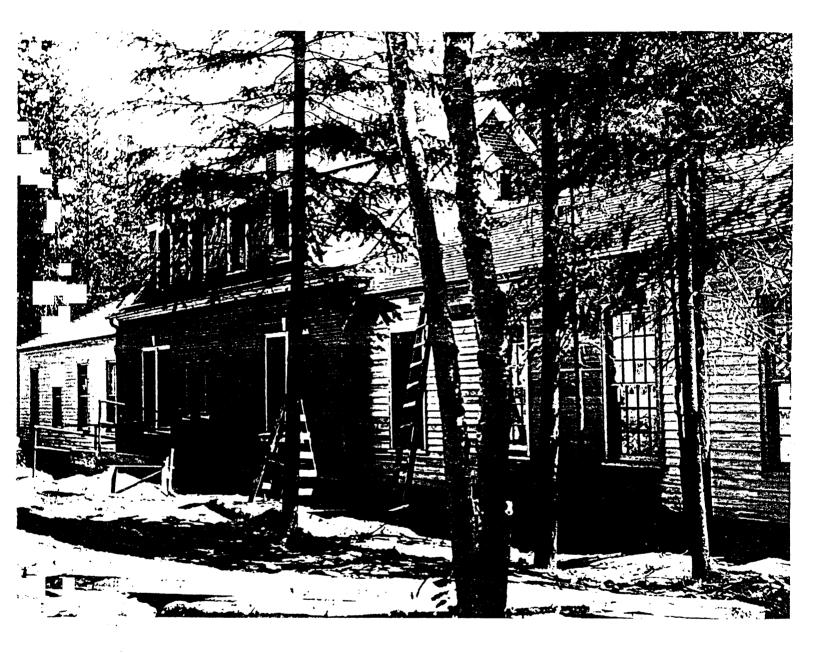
Historic photograph, construction of the two residences, Metaline Falls Inspection Station, view from the northeast, 11/1/1932.
